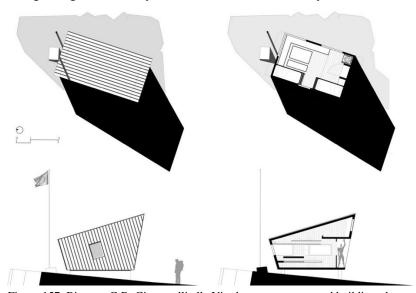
Bivouac G.B. Giacomelli alla Vigolana, prospectus and building plans
